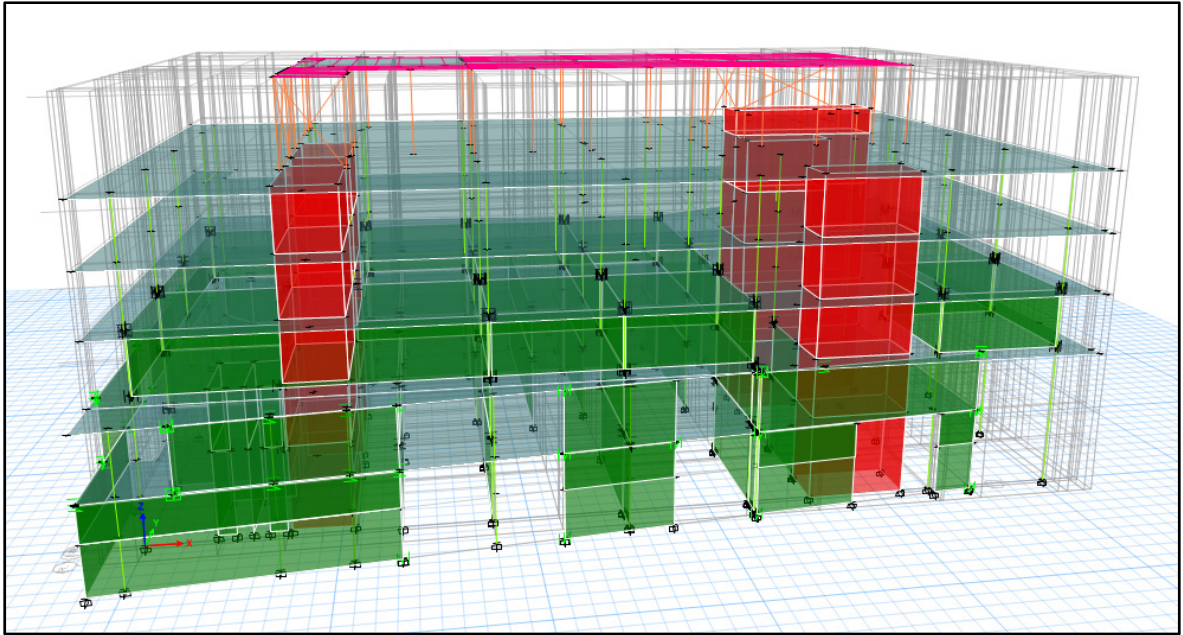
Masonry walls in the ground, 2nd, and 3rd floors
